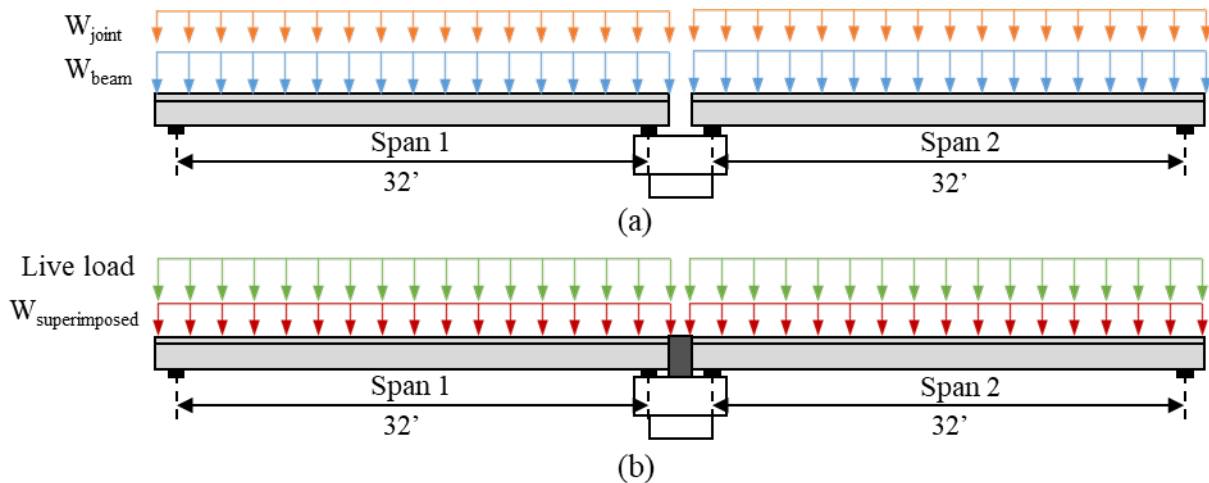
Load schematics for (a) Bridge 1 and (b) Bridge 2
